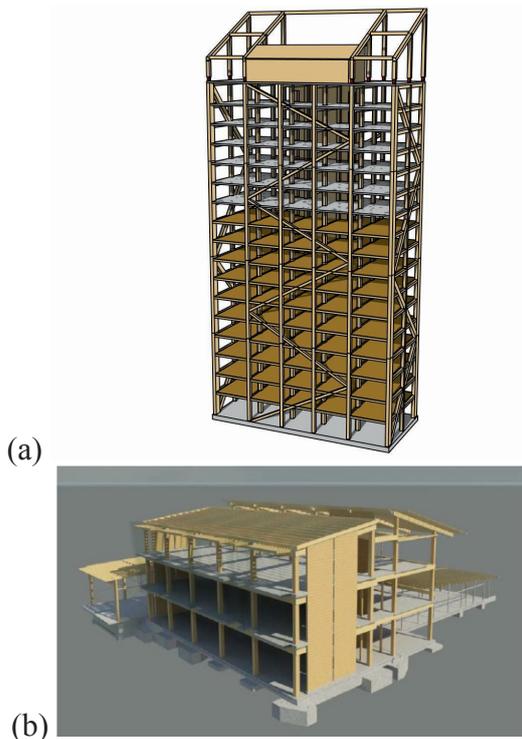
Multi-storey framework timber buildings: (a) the world's tallest timber building, Mjosa Tower, which has 18 floors [6]; (b) NMIT Arts and Media Building [7].
